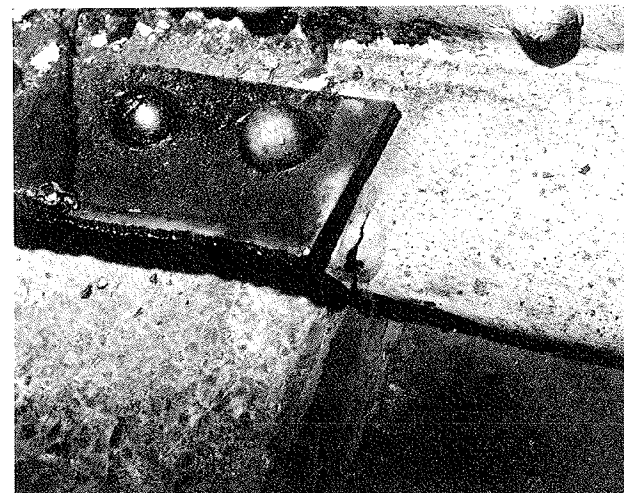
Preexisting crack in compression flange next to bracing connections.
